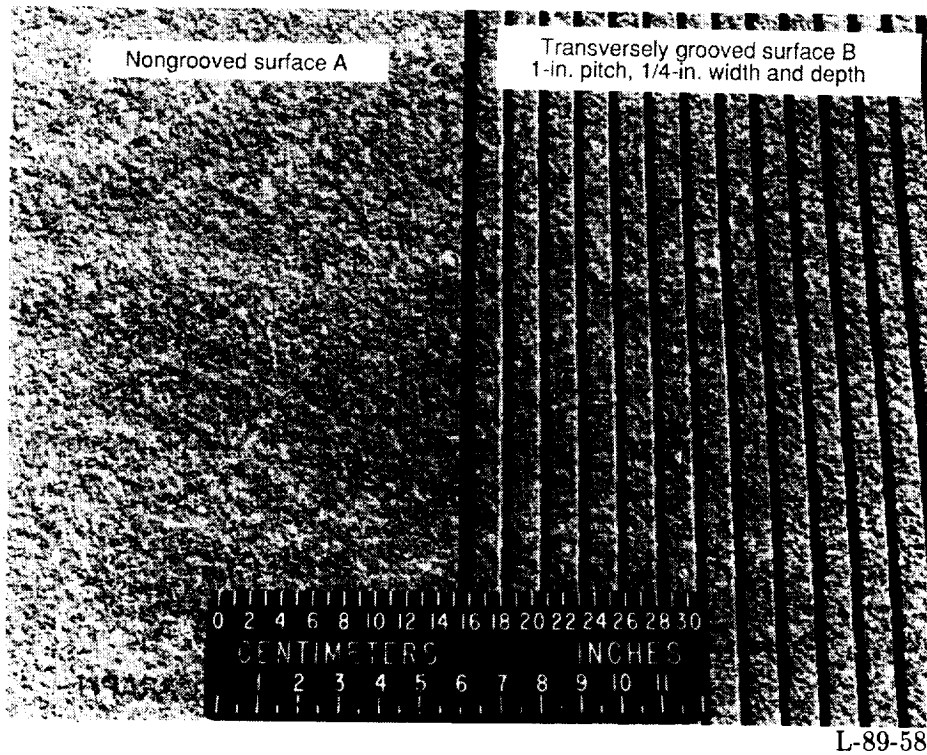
Close-up photographs of concrete test surfaces A (nongrooved) and B (transversely grooved, 1 in. x 0.25 in. x 0.25 in.) on runway 4/22 at Wallops Flight Facility.
